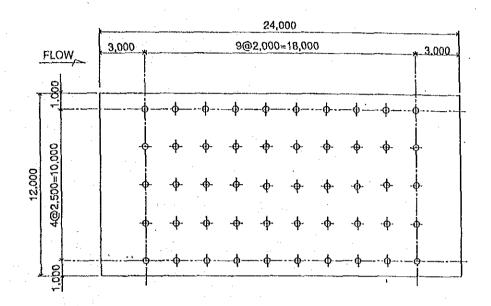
PILE ARRANGEMENT FOR PIERS
